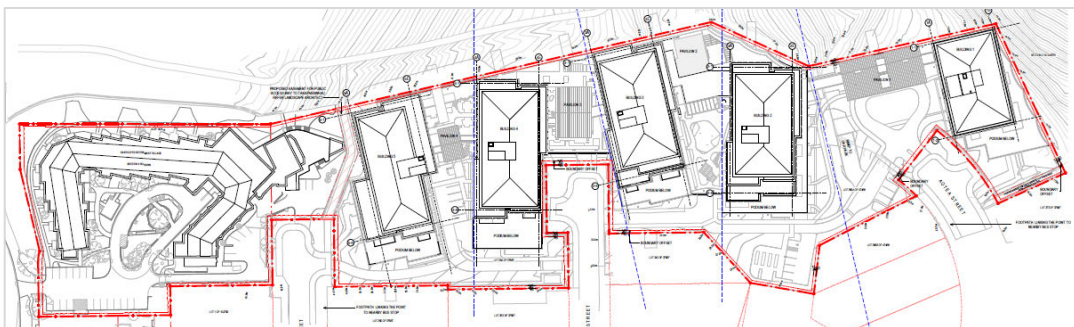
Proposed Site layout (Source: Drawing RC03-01 – Architectural Drawings).
